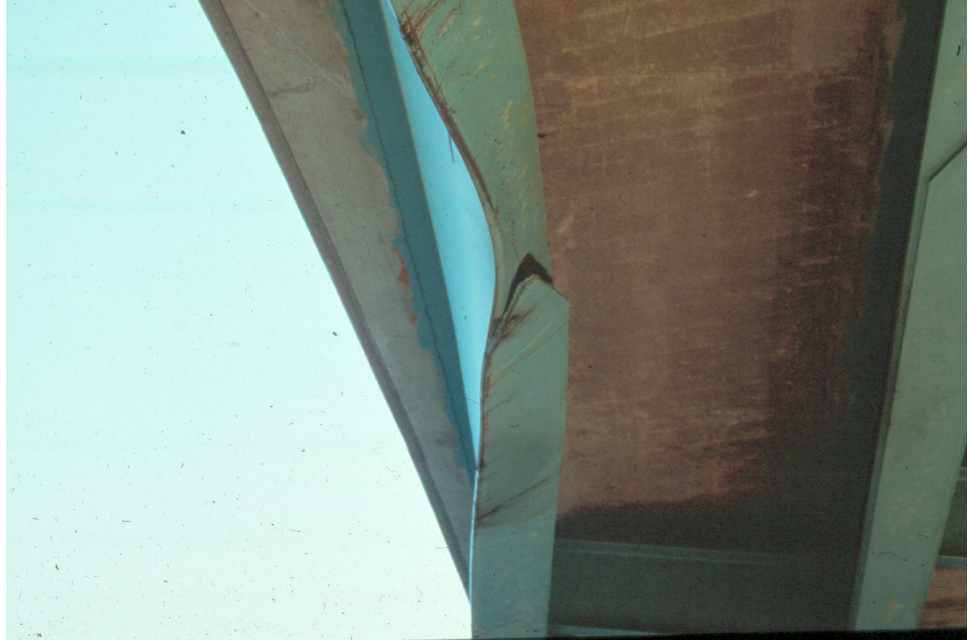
Collision Damage on a Rolled Multi-Beam Bridge
